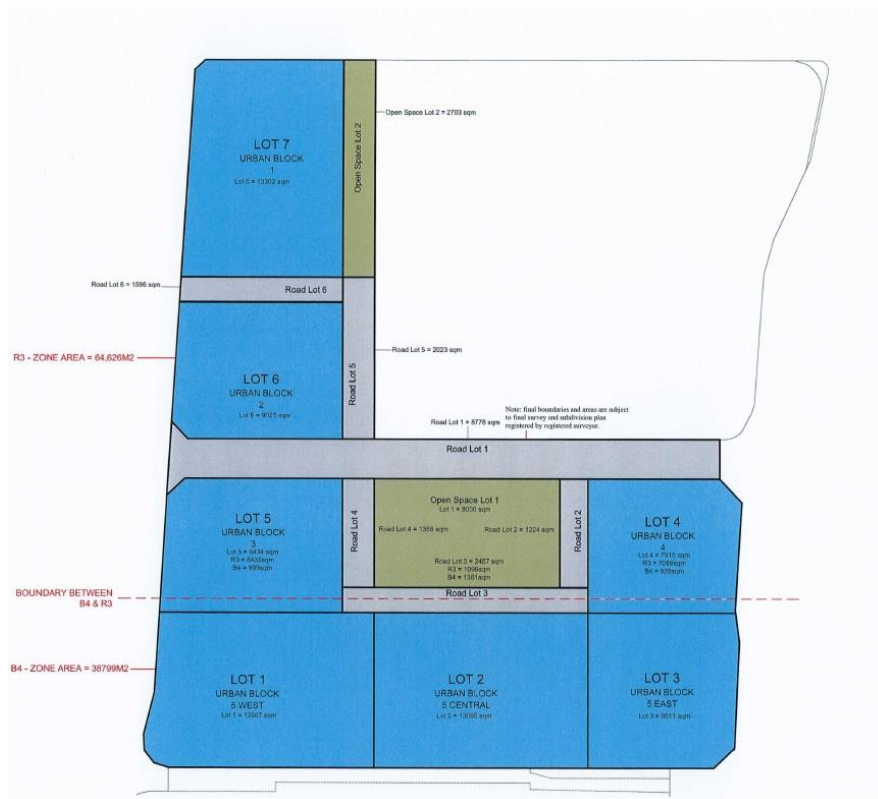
Approved Master plan concept subdivision plan DA-14/96
